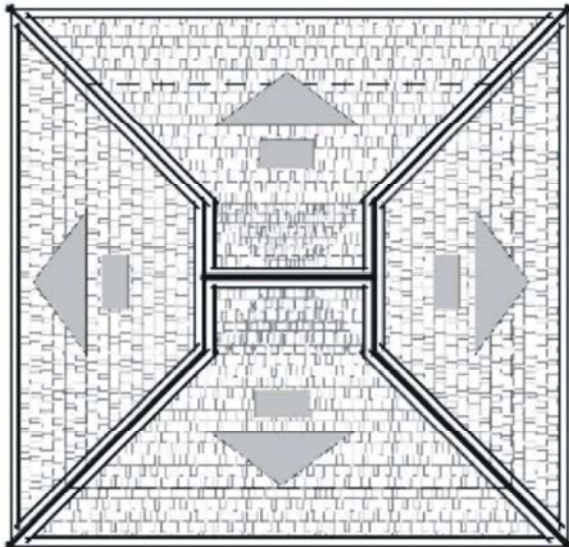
Plan of a concrete facia roof with ducts to let in air and outlet at the rooftop
